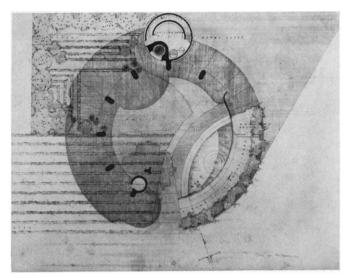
David Wright House, Phoenix, Ariz. Groundfloor plan. 1952.
